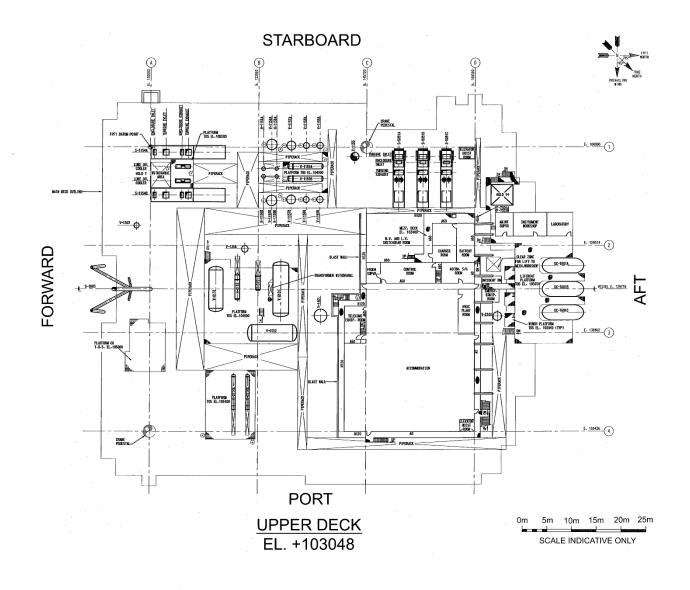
FPF-1 plan view – upper deck (EL. +103048)
